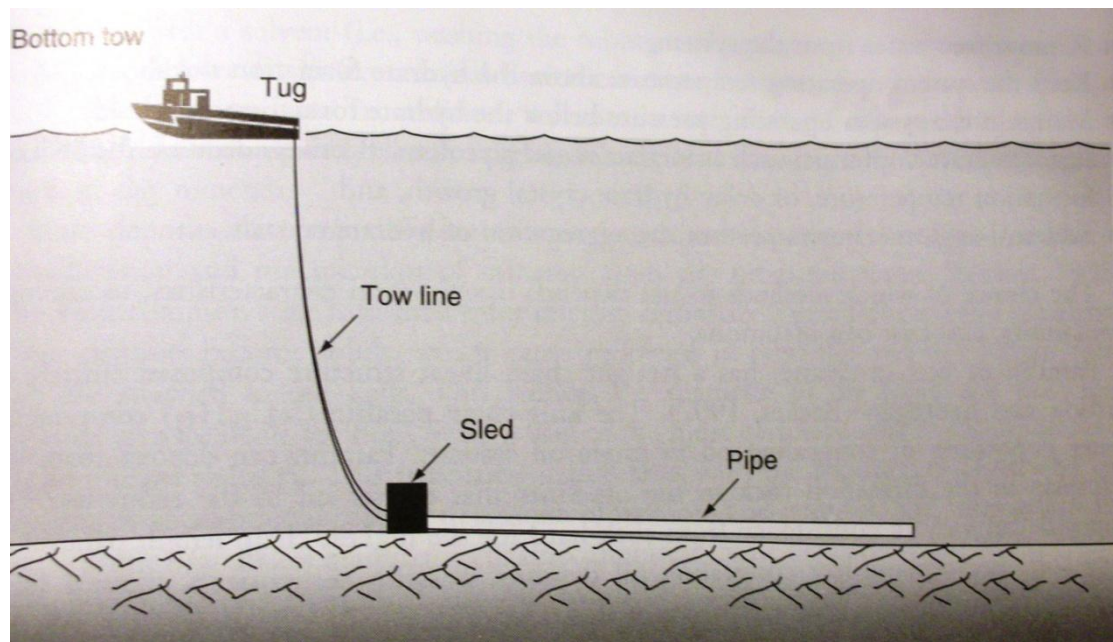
Bottom Tow for Pipeline Installation (Boyun Guo et al., 2005)
